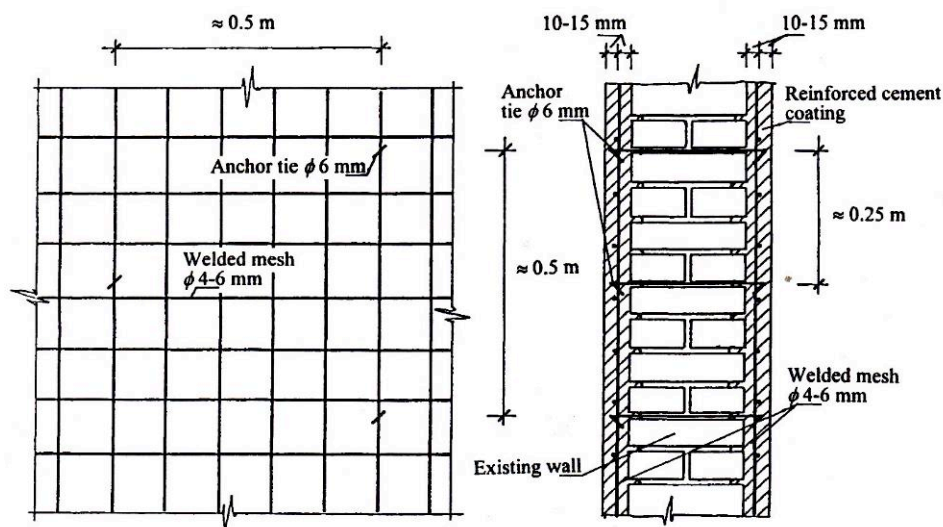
Application of r.c. coating to brick-masonry walls [21]
